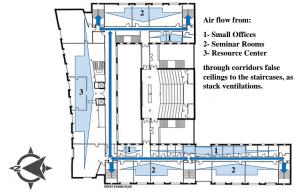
Portland Building: Plan of Internal Stack Ventilation System Source: Developed by the Authors from:
